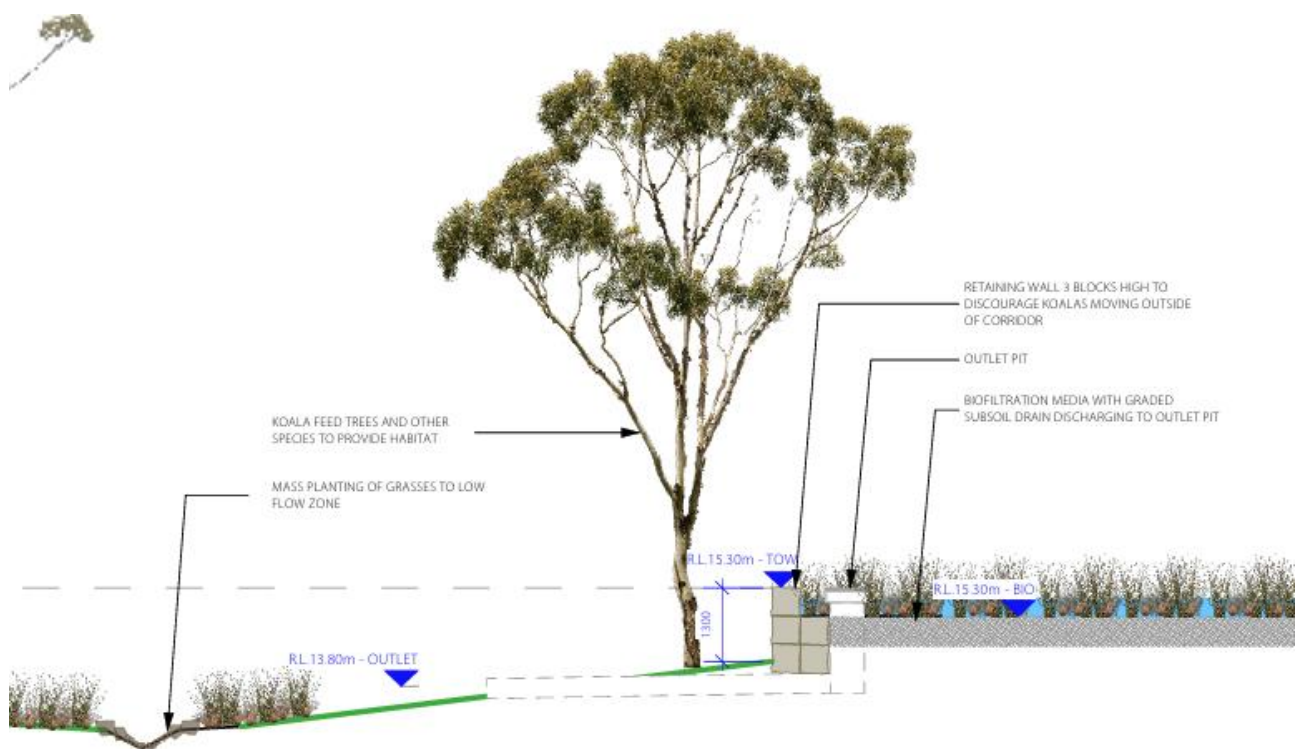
Extract from Terras Landscape Architects 2024, plan L504
